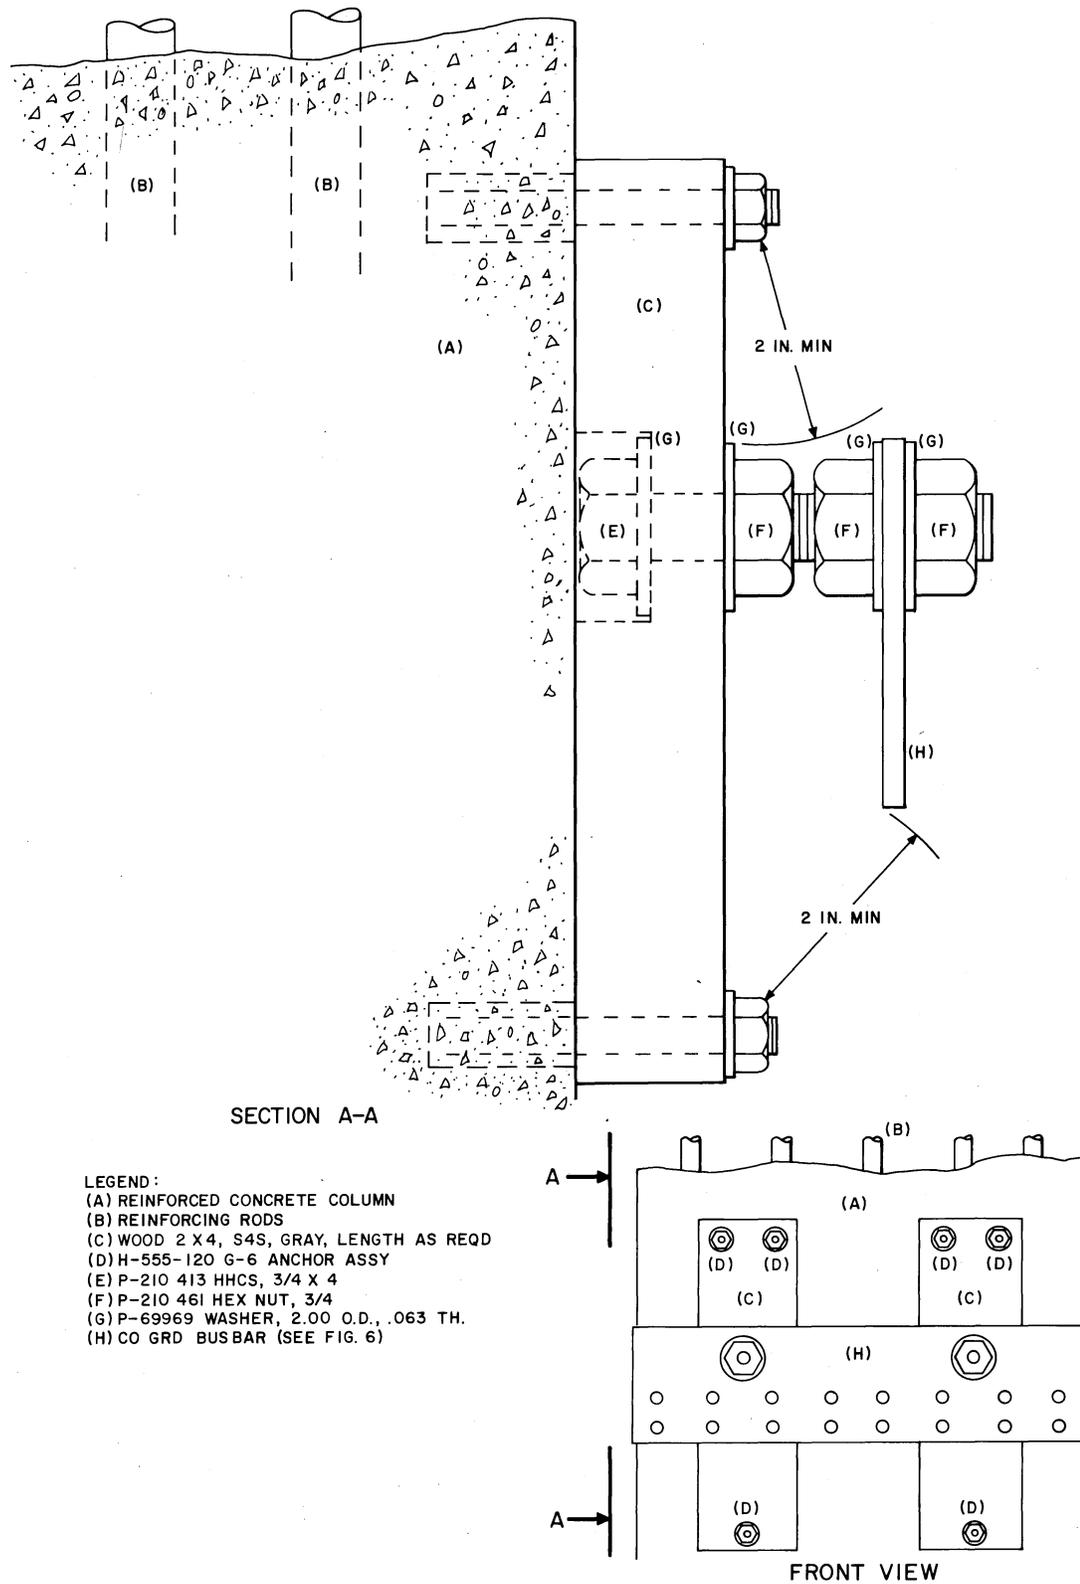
Typical Mounting of CO GRD Bus Bar on Reinforced Concrete Column or Wall To Avoid Lightning Current Sparkover
